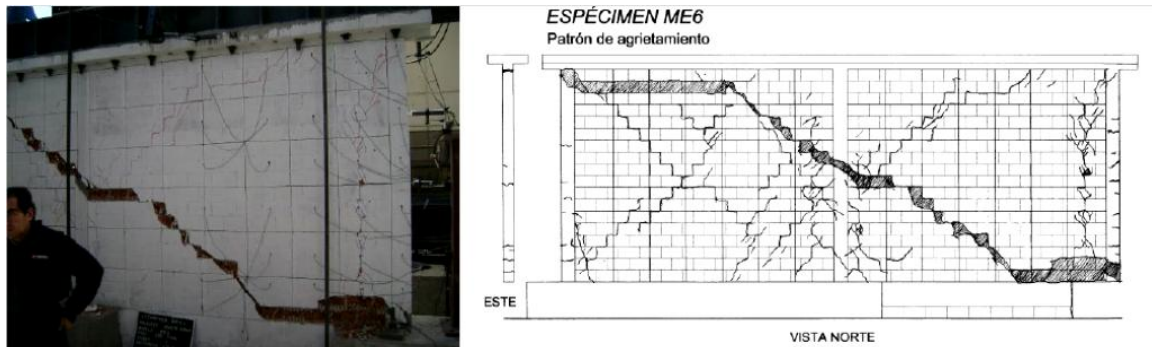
Cyclic test of two bay confined masonry wall (Perez-Gavilan et al. 2009)
